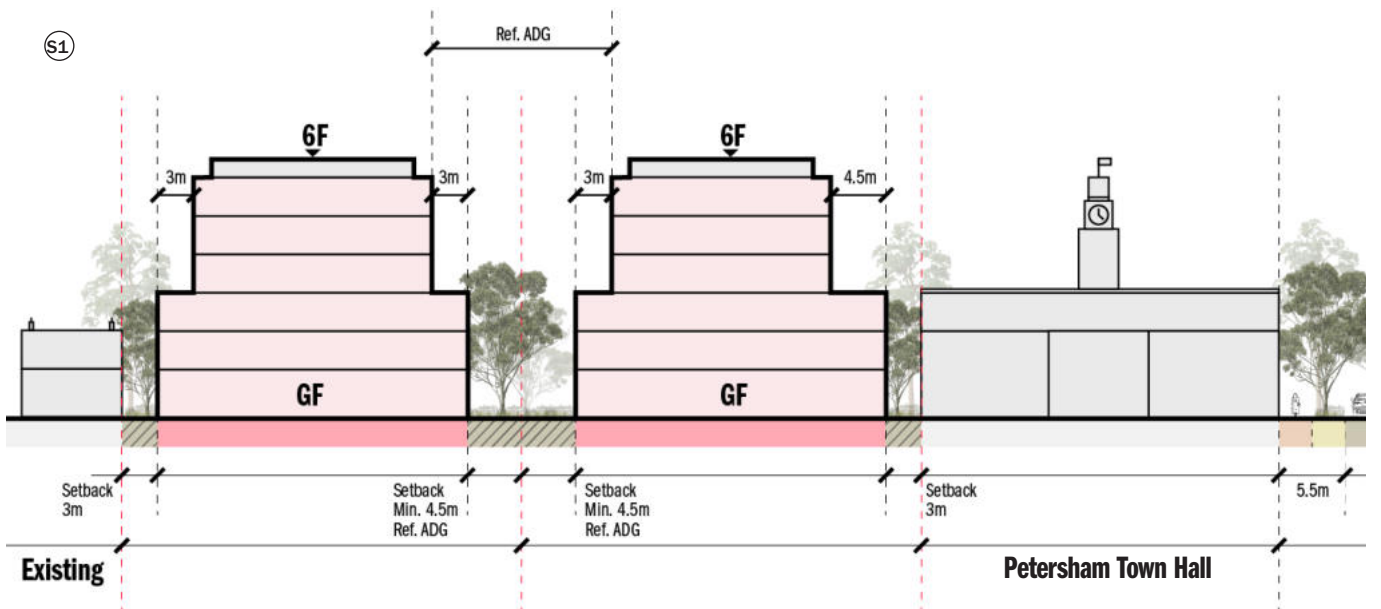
Section 1 - Front elevation from Crystal Street showing the change areas in relation to the existing built form and Petersham Town Hall
